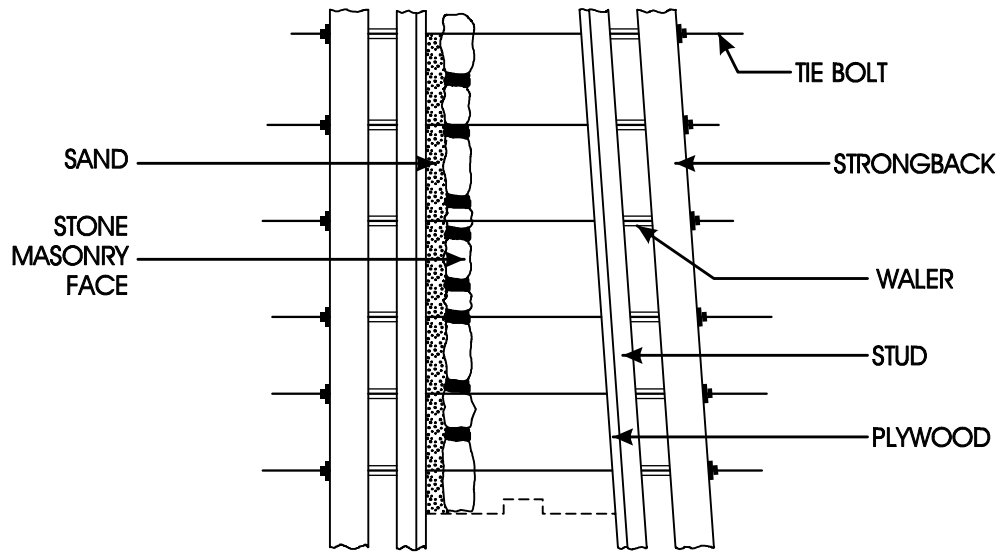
Sand Method of Securing Stone Masonry Faces for Concrete Placement
